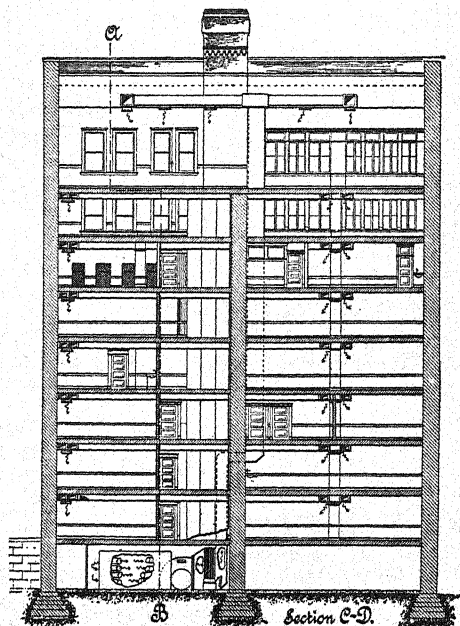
Chicago Telephone Company. Plan of ventilating plant.
